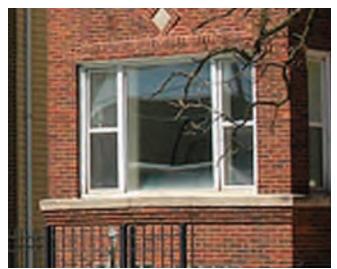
ROWHOUSE TYPE WINDOWS
